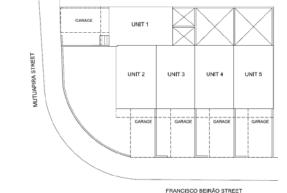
Situation plan of the studied building. Source: Adapted from Condeixa, 2013.
